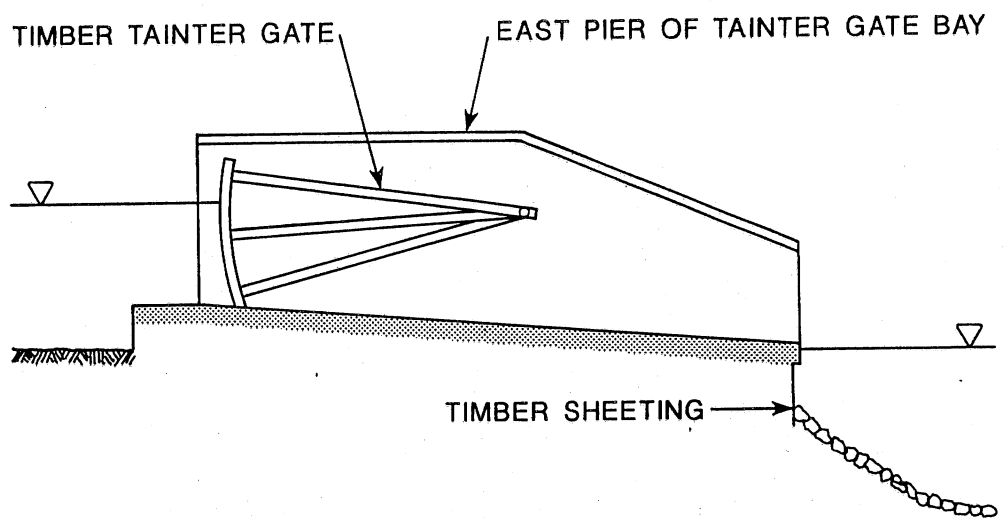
Cross section of Amery Dam tainter gate spillway.
